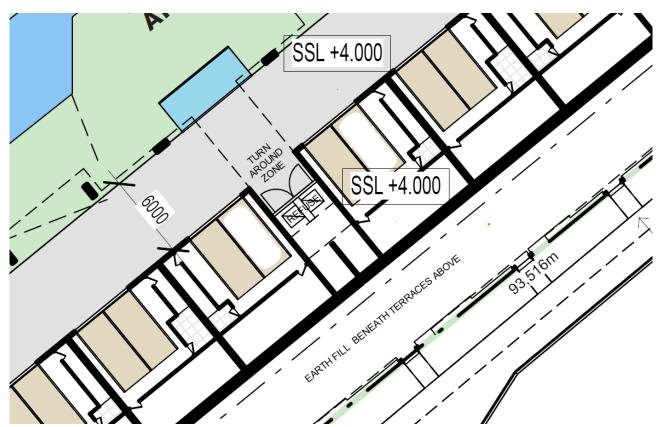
Proposed Townhouse Bin Storage Area (Source: Archidiom, 2022)
